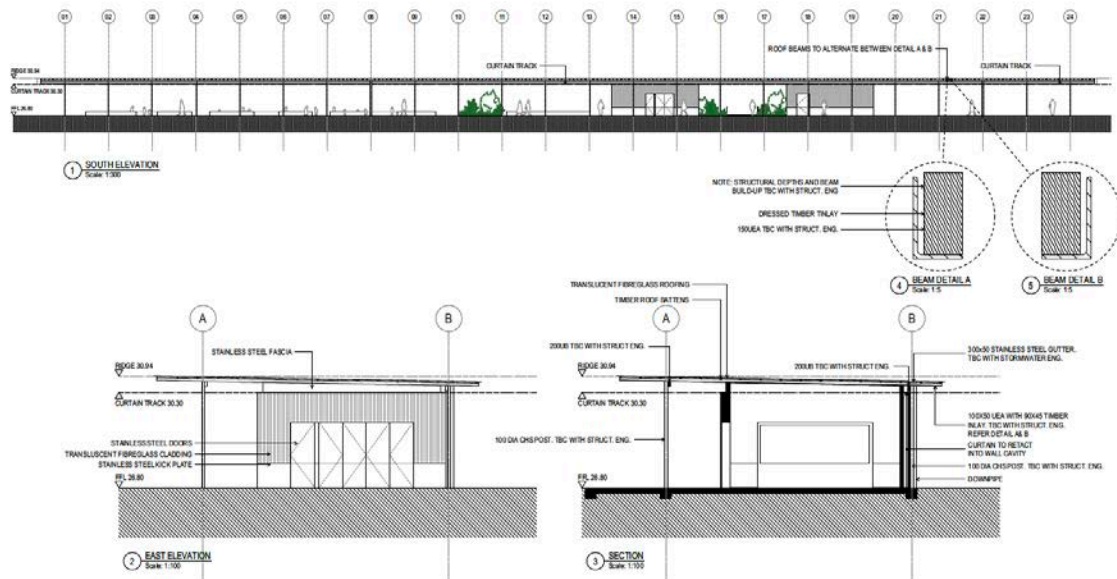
Plan showing the elevation views of the proposed kiosk pavilion. [Source: Breakspear Architects, 2021]
